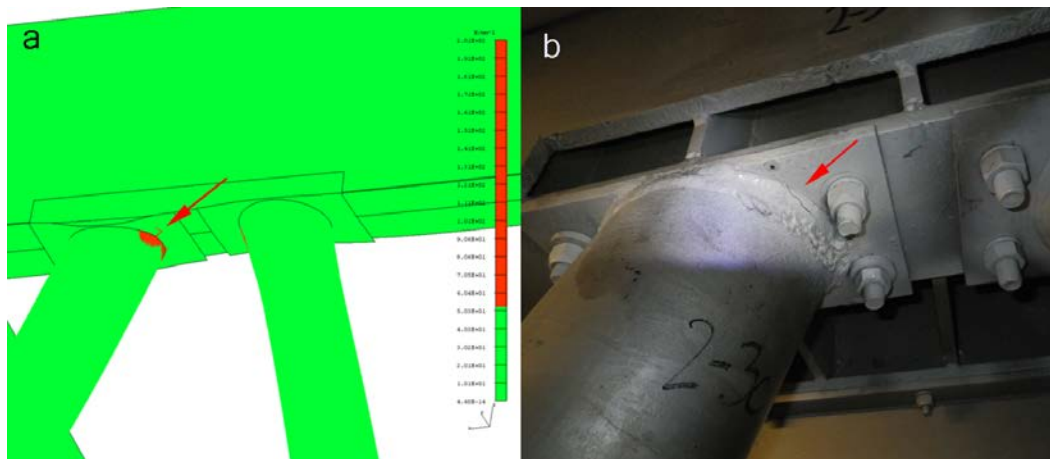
Improper DBS0 weld execution before a. and after b. rectification
